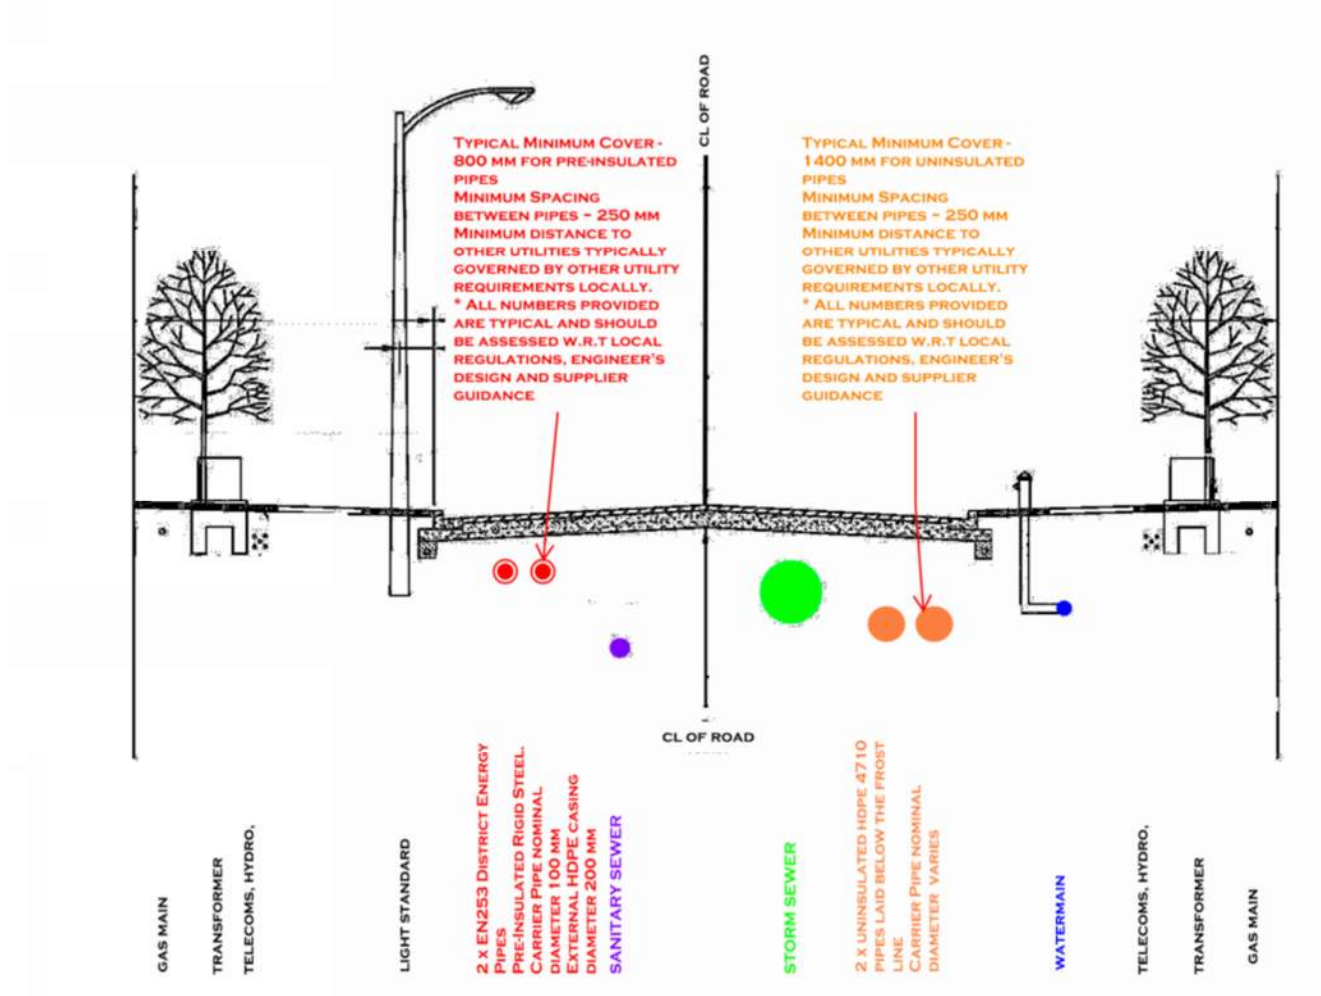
Typical Road Cross Section with Buried Utilities (District Heat Pipe in Red, Ambient Loop in Orange)
